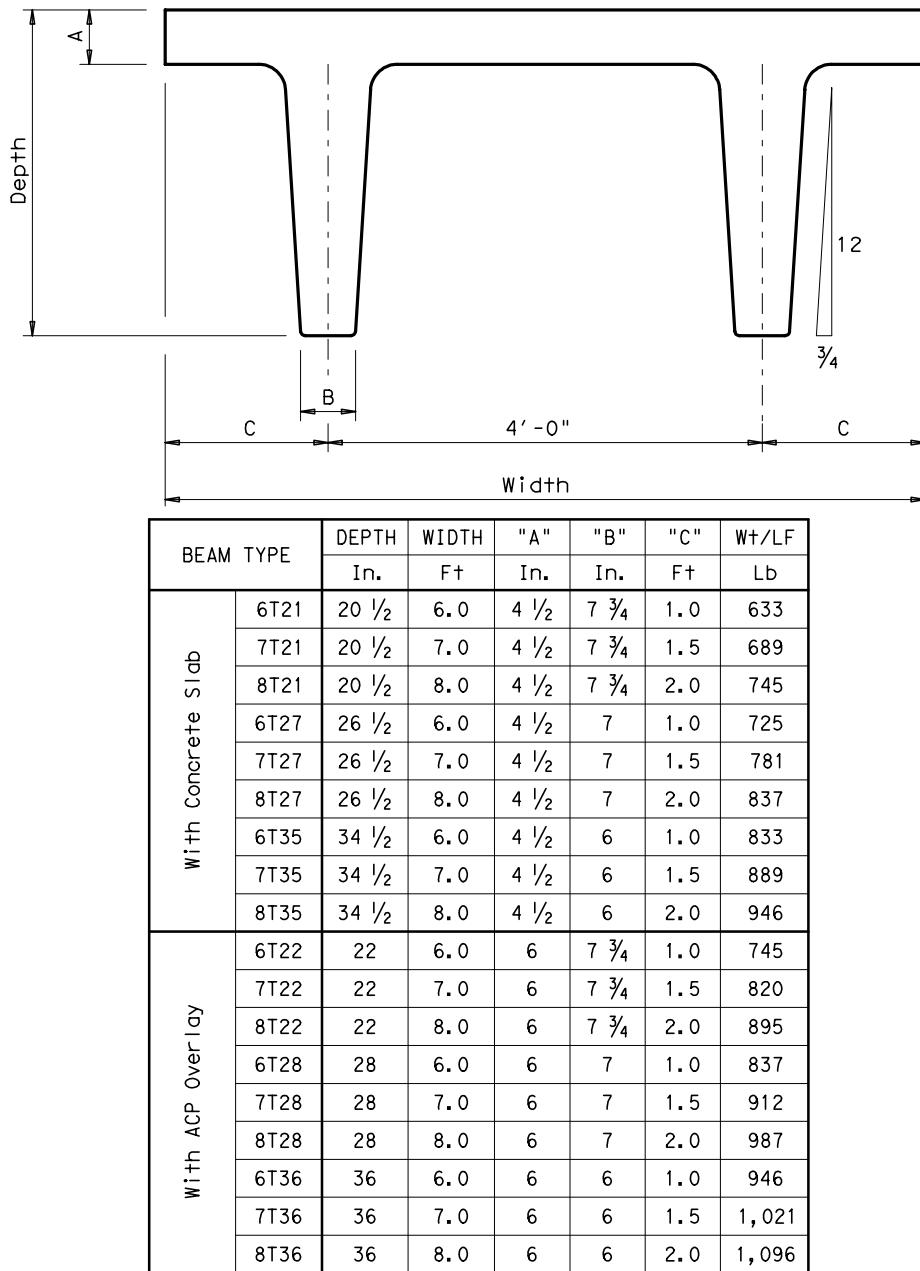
Prestressed Concrete TxDOT Double-T Beam Quick Reference. Online users can click 5-23 to view this illustration in PDF.
